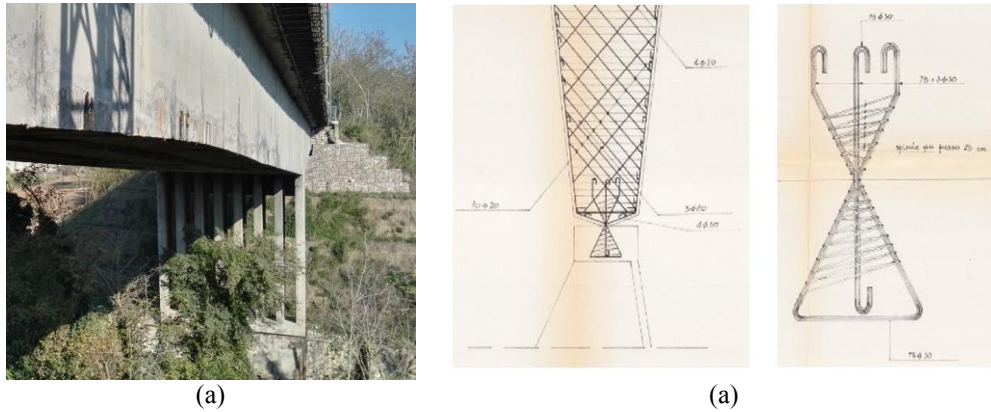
Transversal view of the pier (a) and original detail of the hinges (b).
